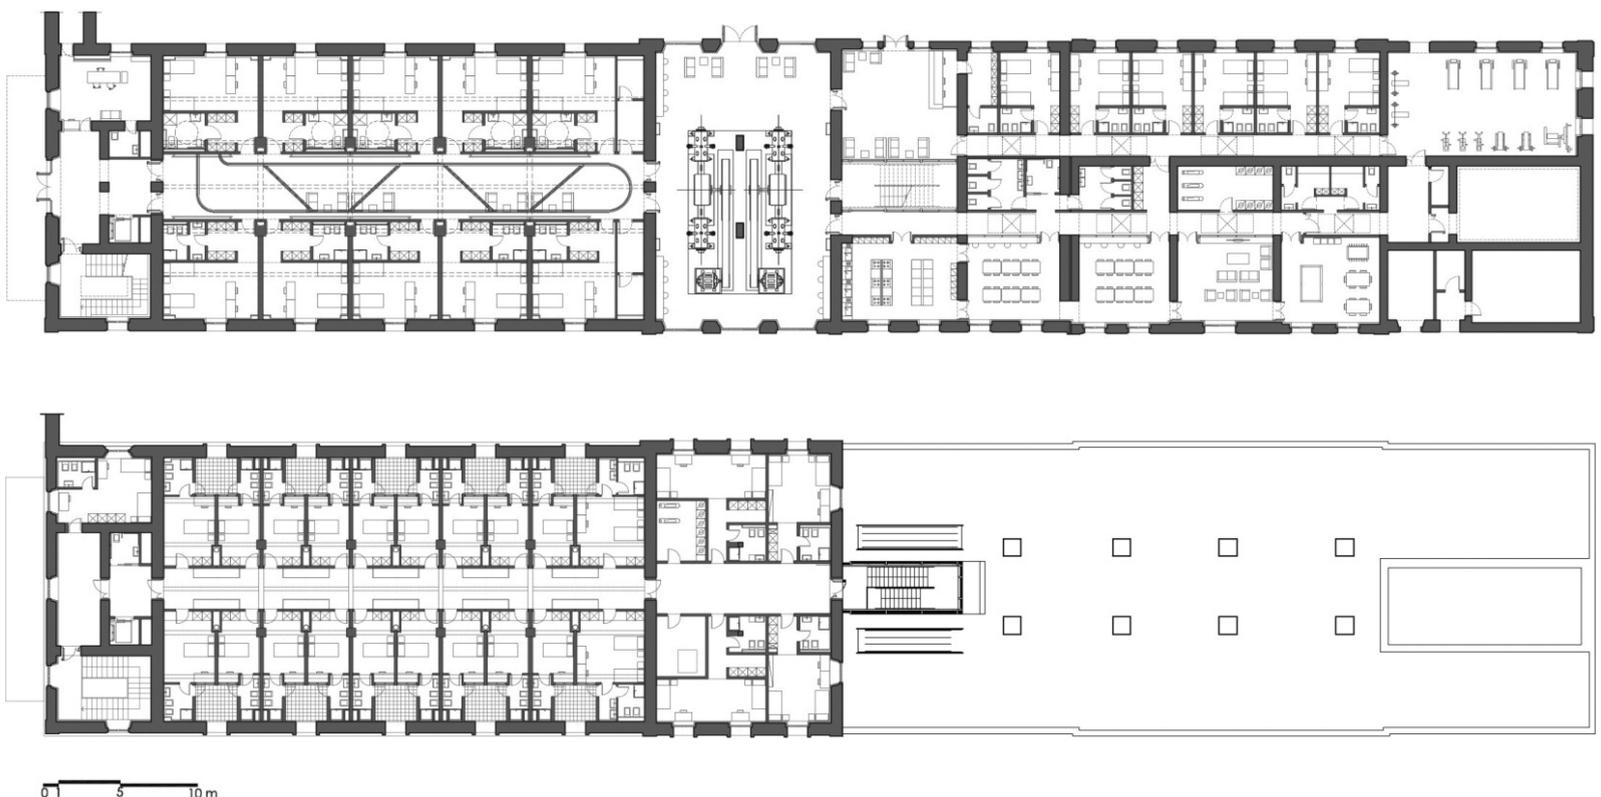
Ground and second floor layout, project. Next page: The room distribution corridor on the first floor and on the ground floor:
